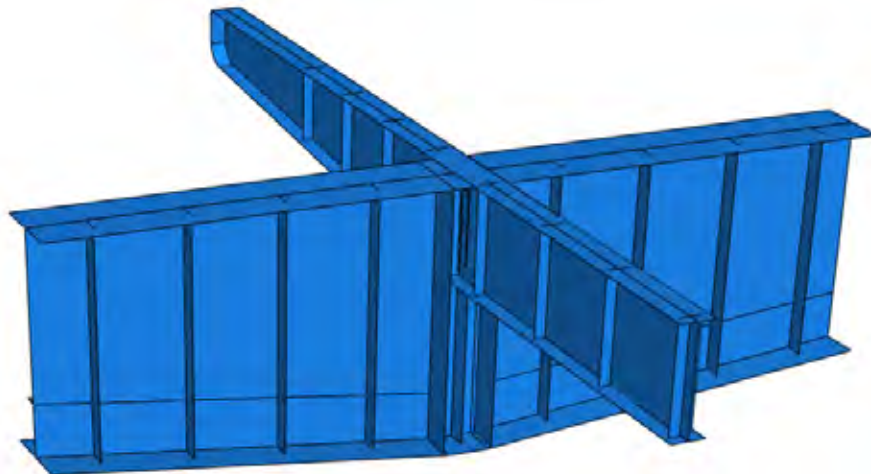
Sub Model Showing Connection of Floor Beam 16 to Girder 2
